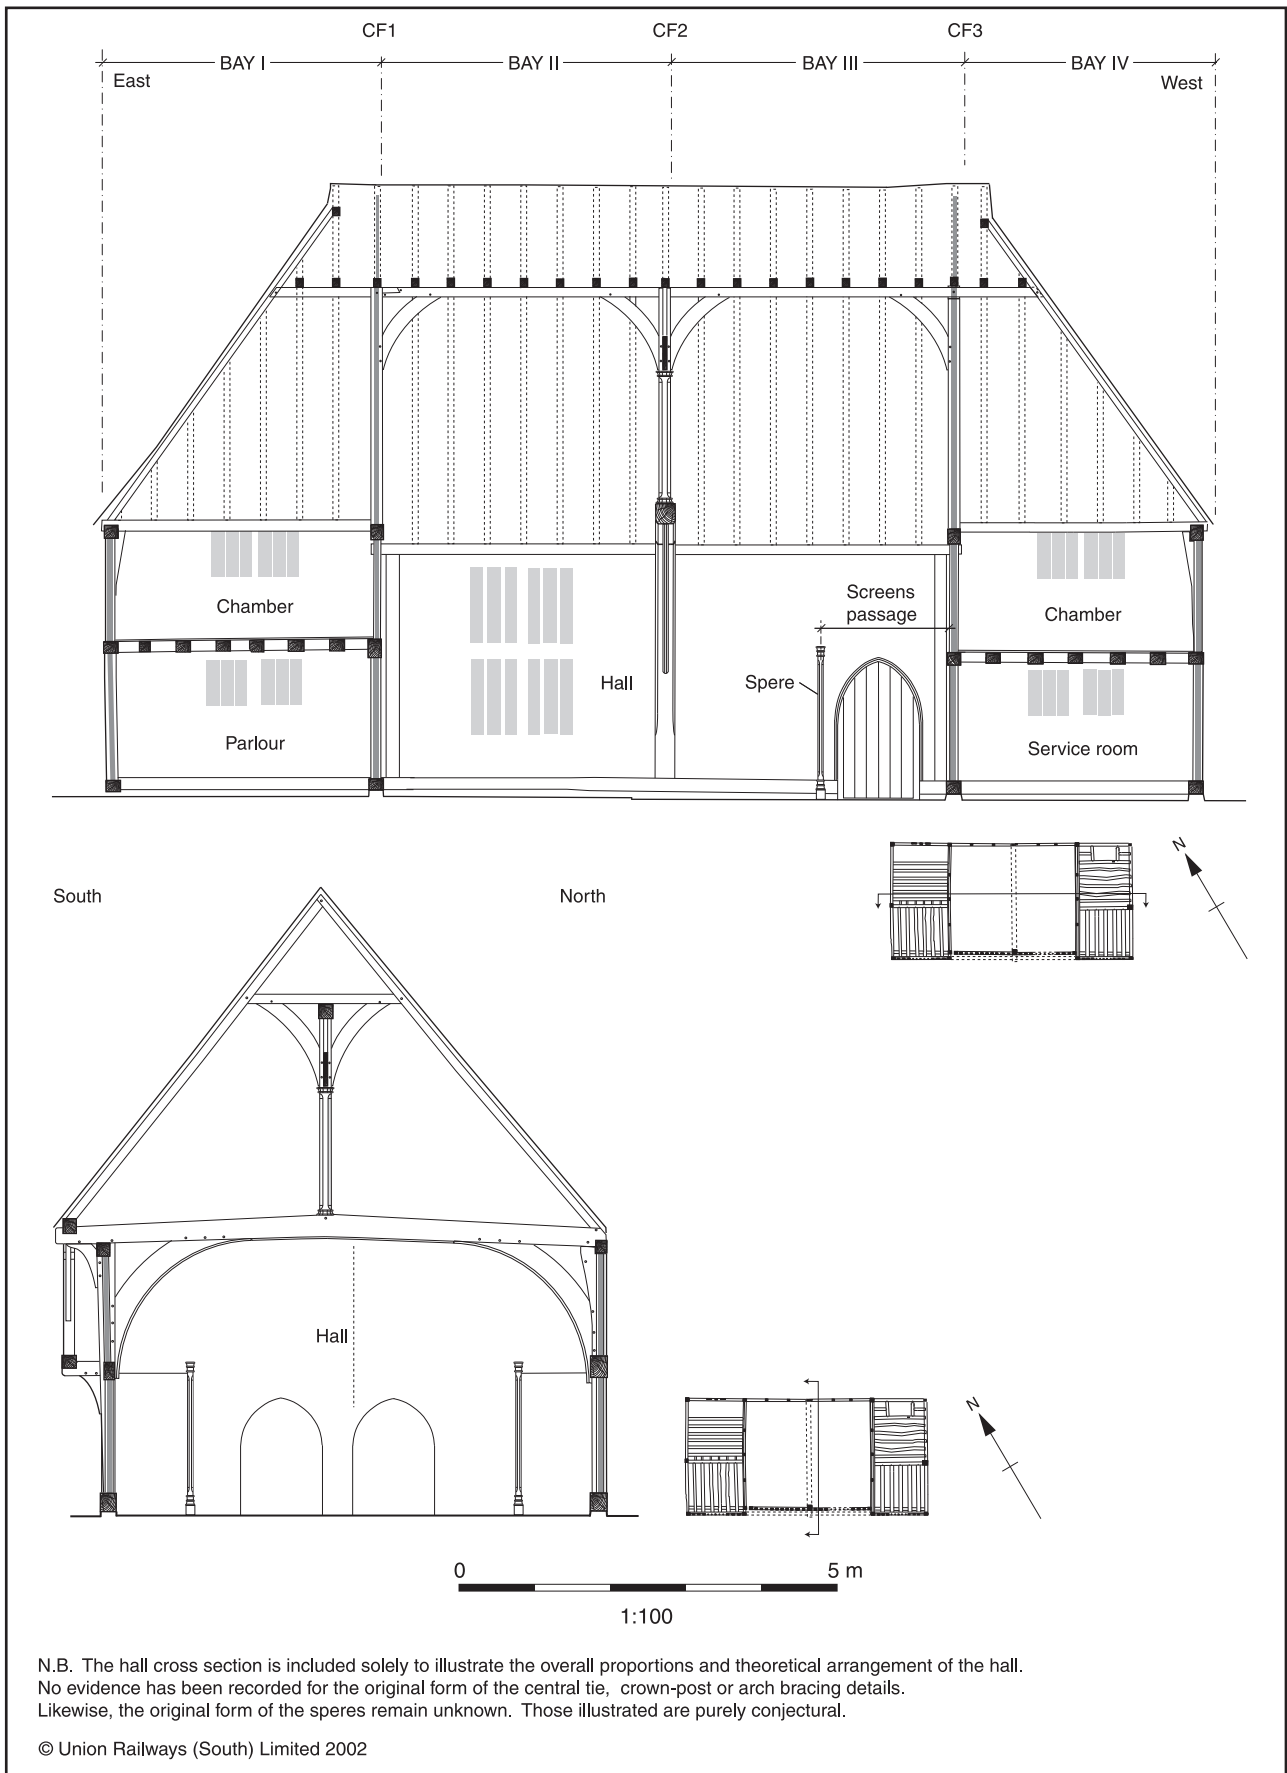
Talbot House: reconstructed longitudinal and hall cross sections in Phase I
